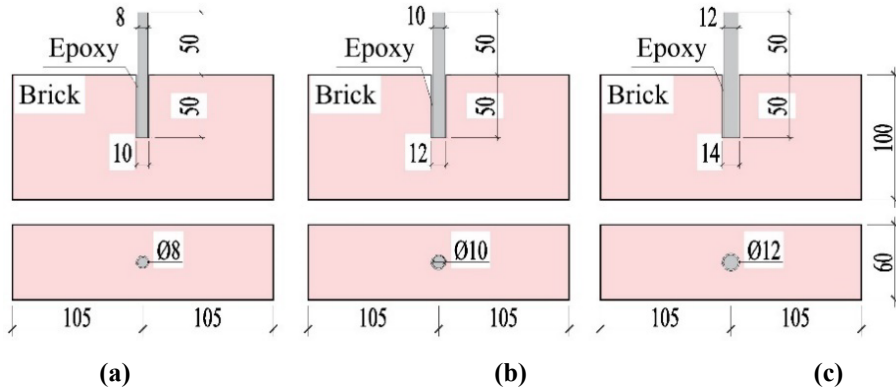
Bolt position and dimension on brick. (a) Specimen using M8 bolt; (b) Specimen using M10 bolt; (c) Specimen using M12 bolt.
